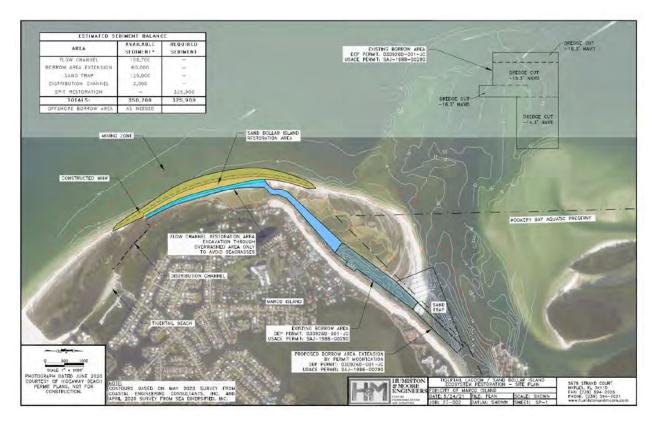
The plan view of the proposed plan for the restoration of Tigertail Lagoon- Sand Dollar Island
